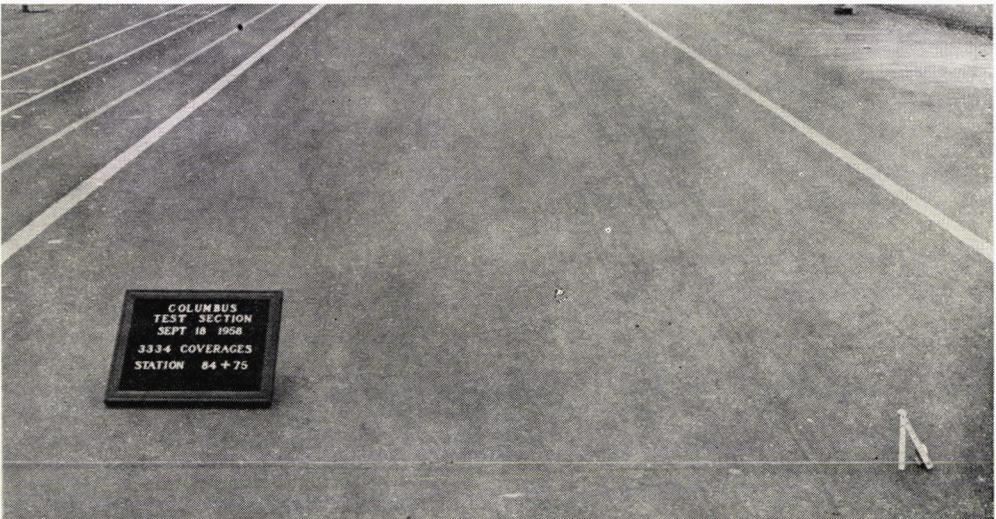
Deformation in flexible pavement structure at 3,334 coverages.
